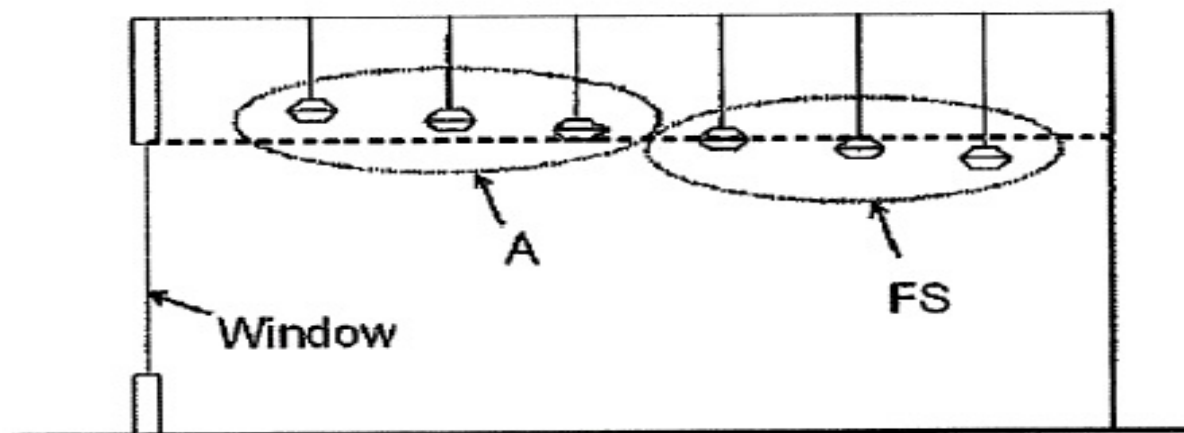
Figure B: Elevation view showing a nonresidential application of indoor lighting, labeled FS, which will be subject to this article and indoor lighting, labeled A, which is installed so that it is not subject to this article. This example presumes the structure in question is not elevated such that any of the luminaries labeled A in the figure
